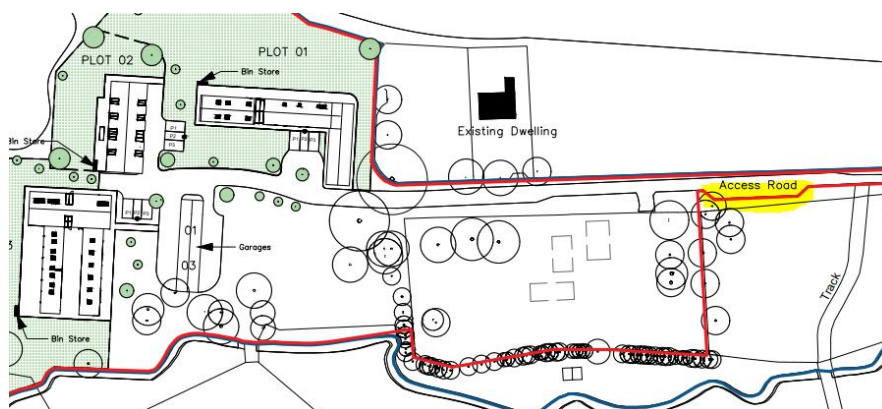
Proposed Site Plan Extract showing Passing Bay (highlighted yellow)
